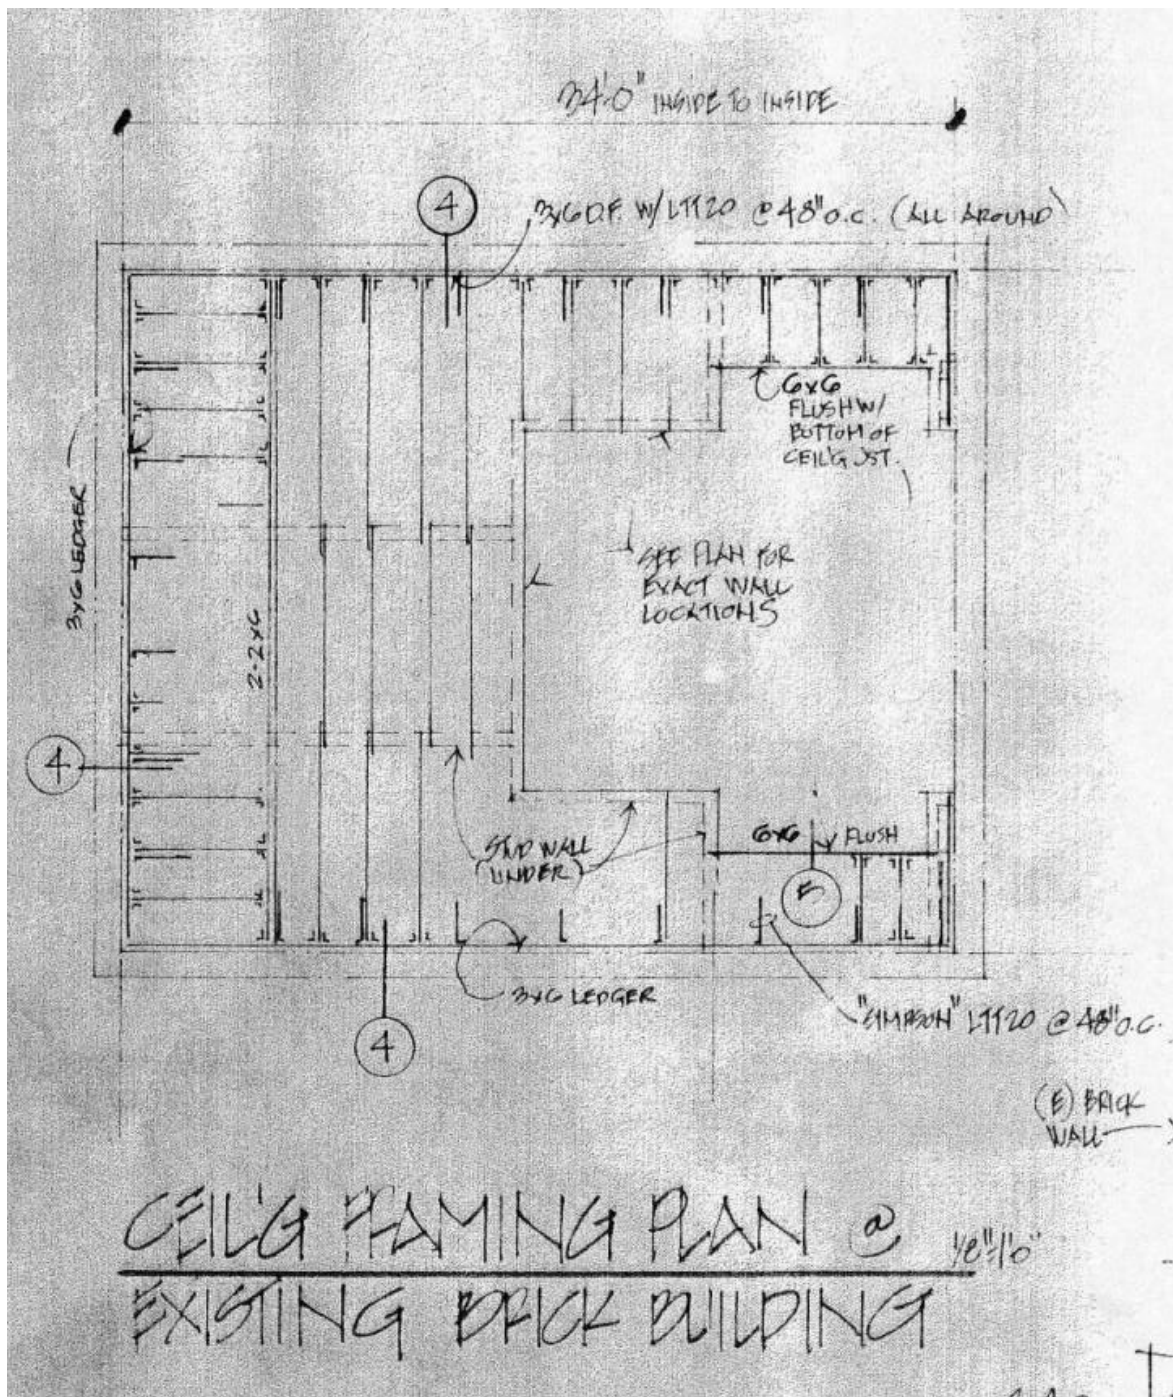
1991 Ceiling framing plan with 1/2" plywood and Simpson LTT20 tension ties @ 4'-0" cc at URM walls
